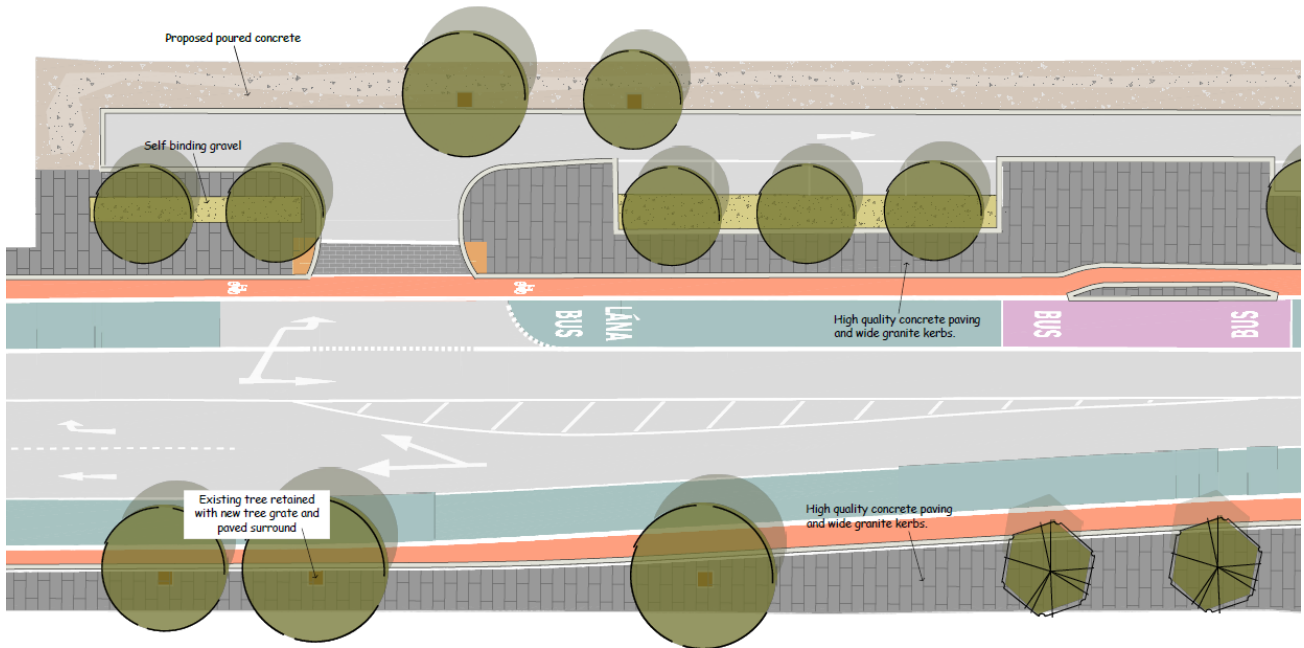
House No. 388 to No. 370 Ballyfermot Road
